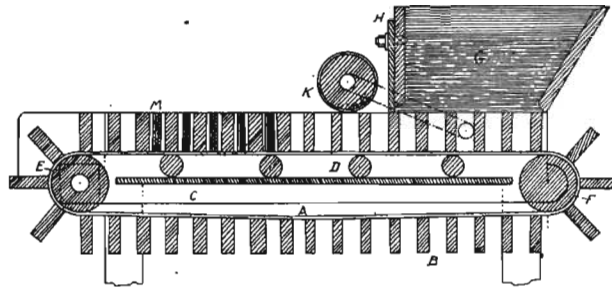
Diagram illustrating one of the methods of making gypsum blocks by machinery.
